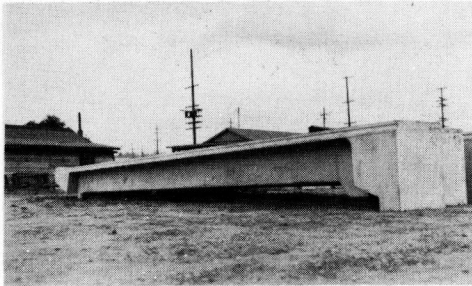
Snow-Sheds, State of Washington - Precast Beams Ready for Hauling
